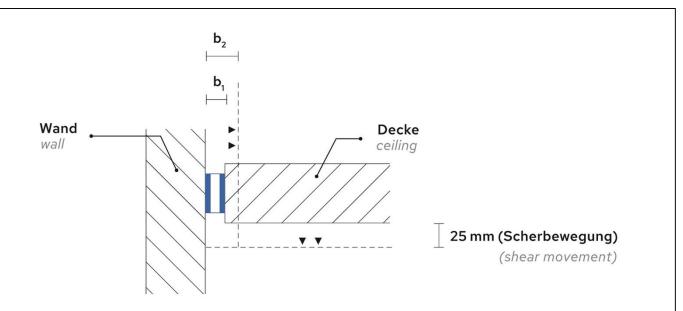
Horizontal ceiling-to-wall joint construction. The maximum lateral expansion (b1 to b2) is 20 mm. The maximum skew of the parts (shearing distance) is 25 mm.
